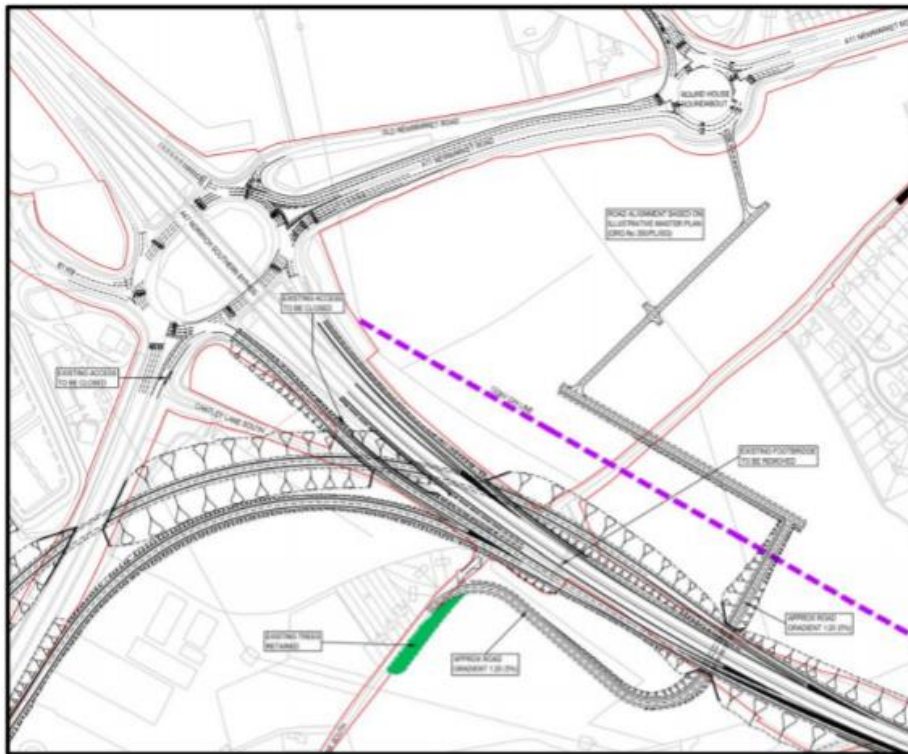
Option 2: Connection of Cantley Lane South to Round House Way roundabout via an A47 overbridge
